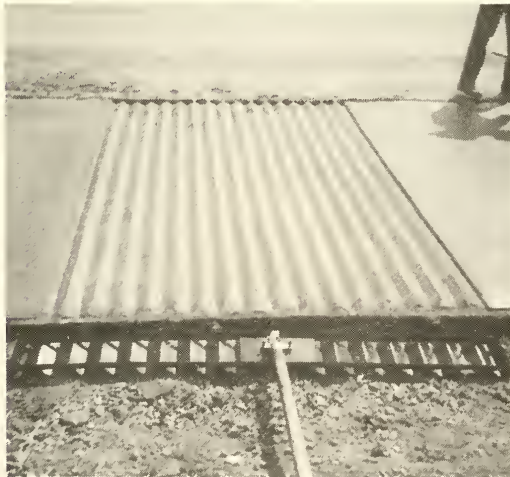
FORMING A RUMBLE STRIP IN CONCRETE SHOULDER WITH CORRUGATED METAL PLATE
